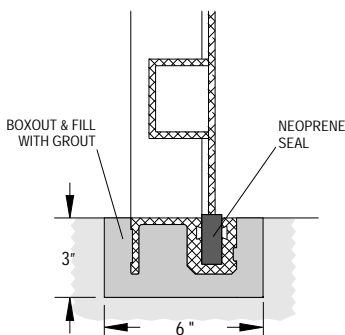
721- Aluminum Embedded Frame In-Channel Mounting; Section BB
